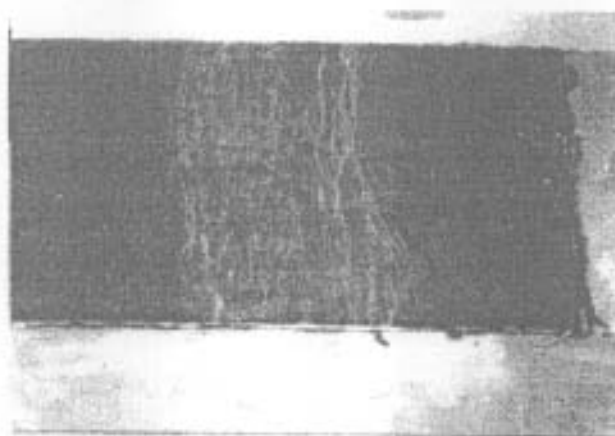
Failure pattern of the beam PC3L6, many small crack in matrix system and on the concrete surface are shown.
